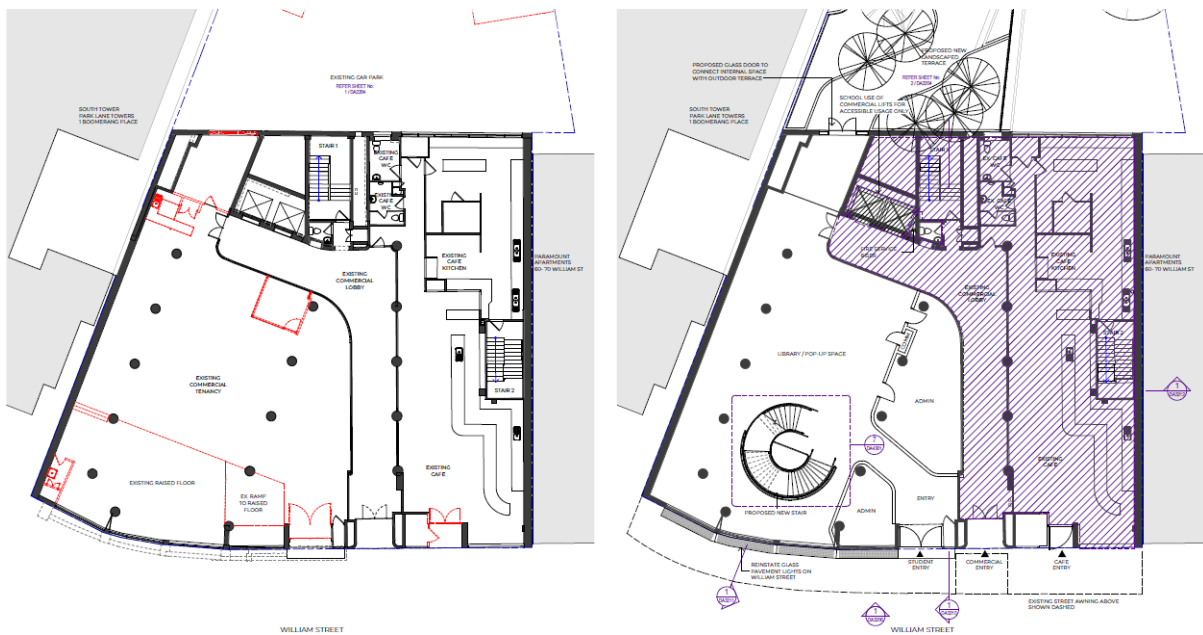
Proposed ground floor demolition (left) and proposed ground floor plan (right)
